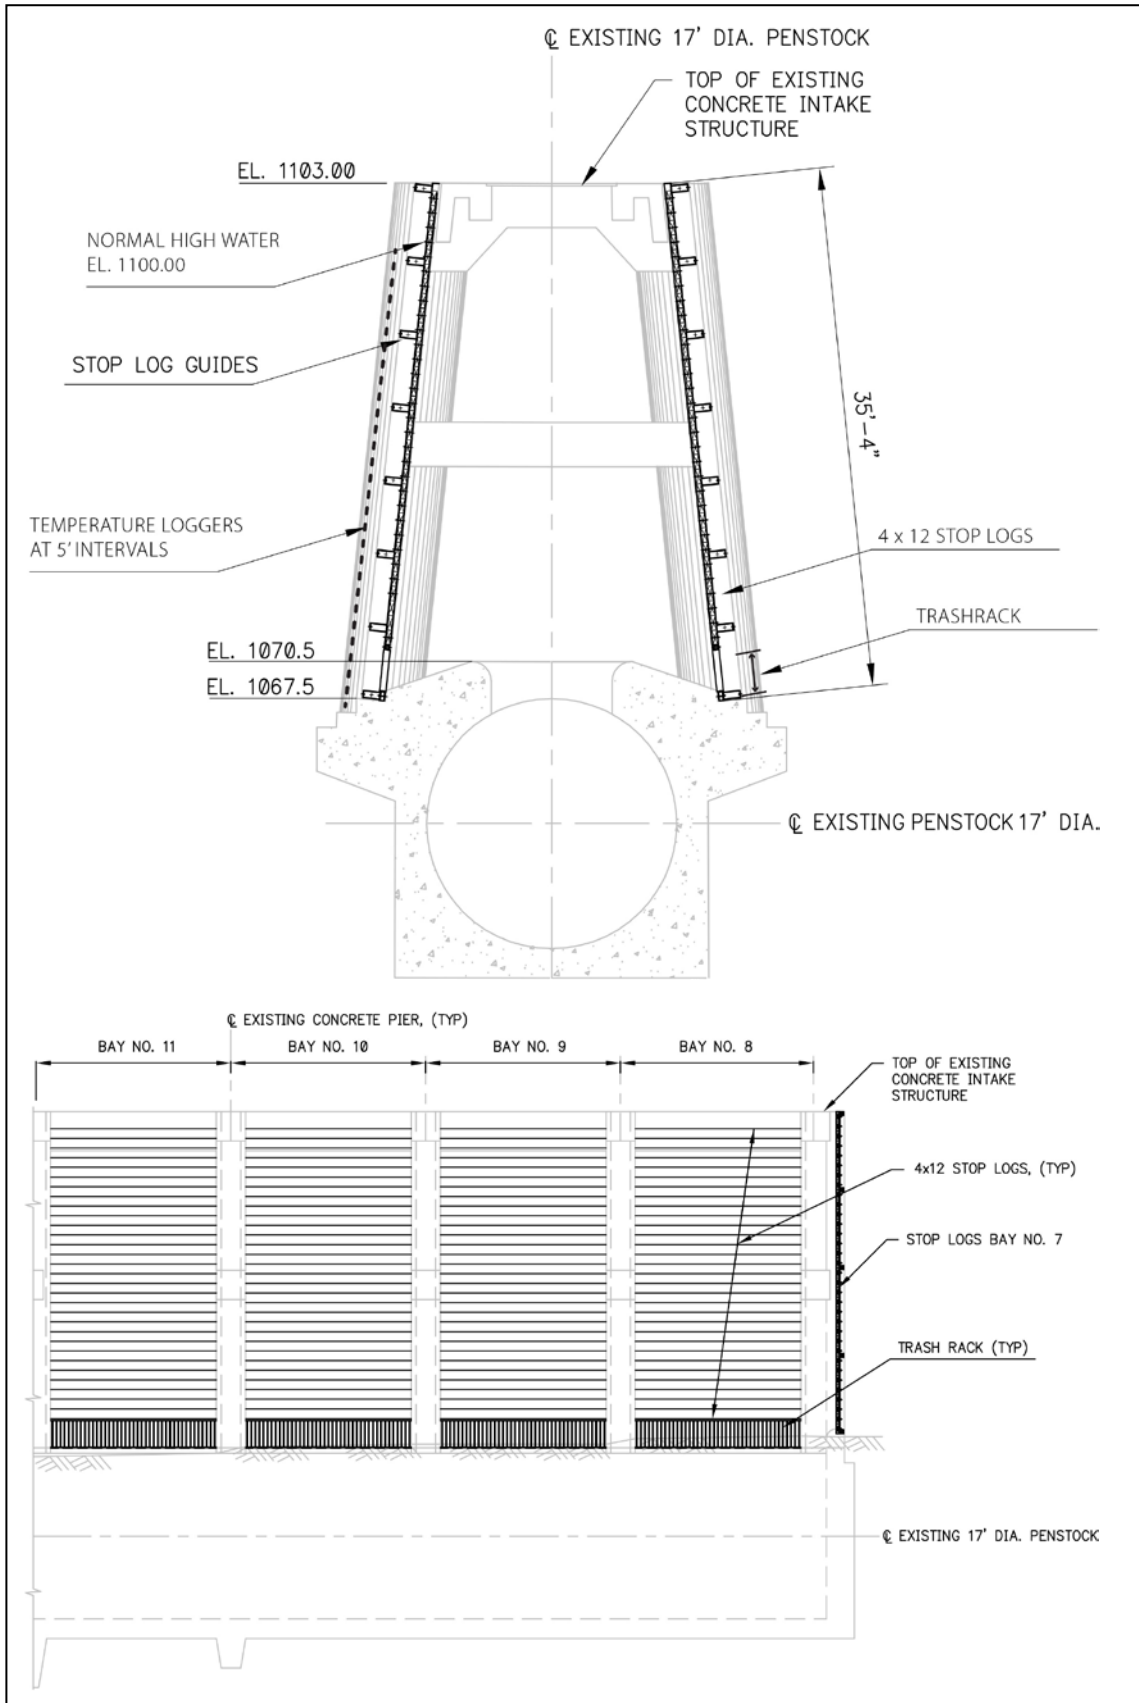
Low Level Outlet intake details and forebay thermistor string vertical position.
